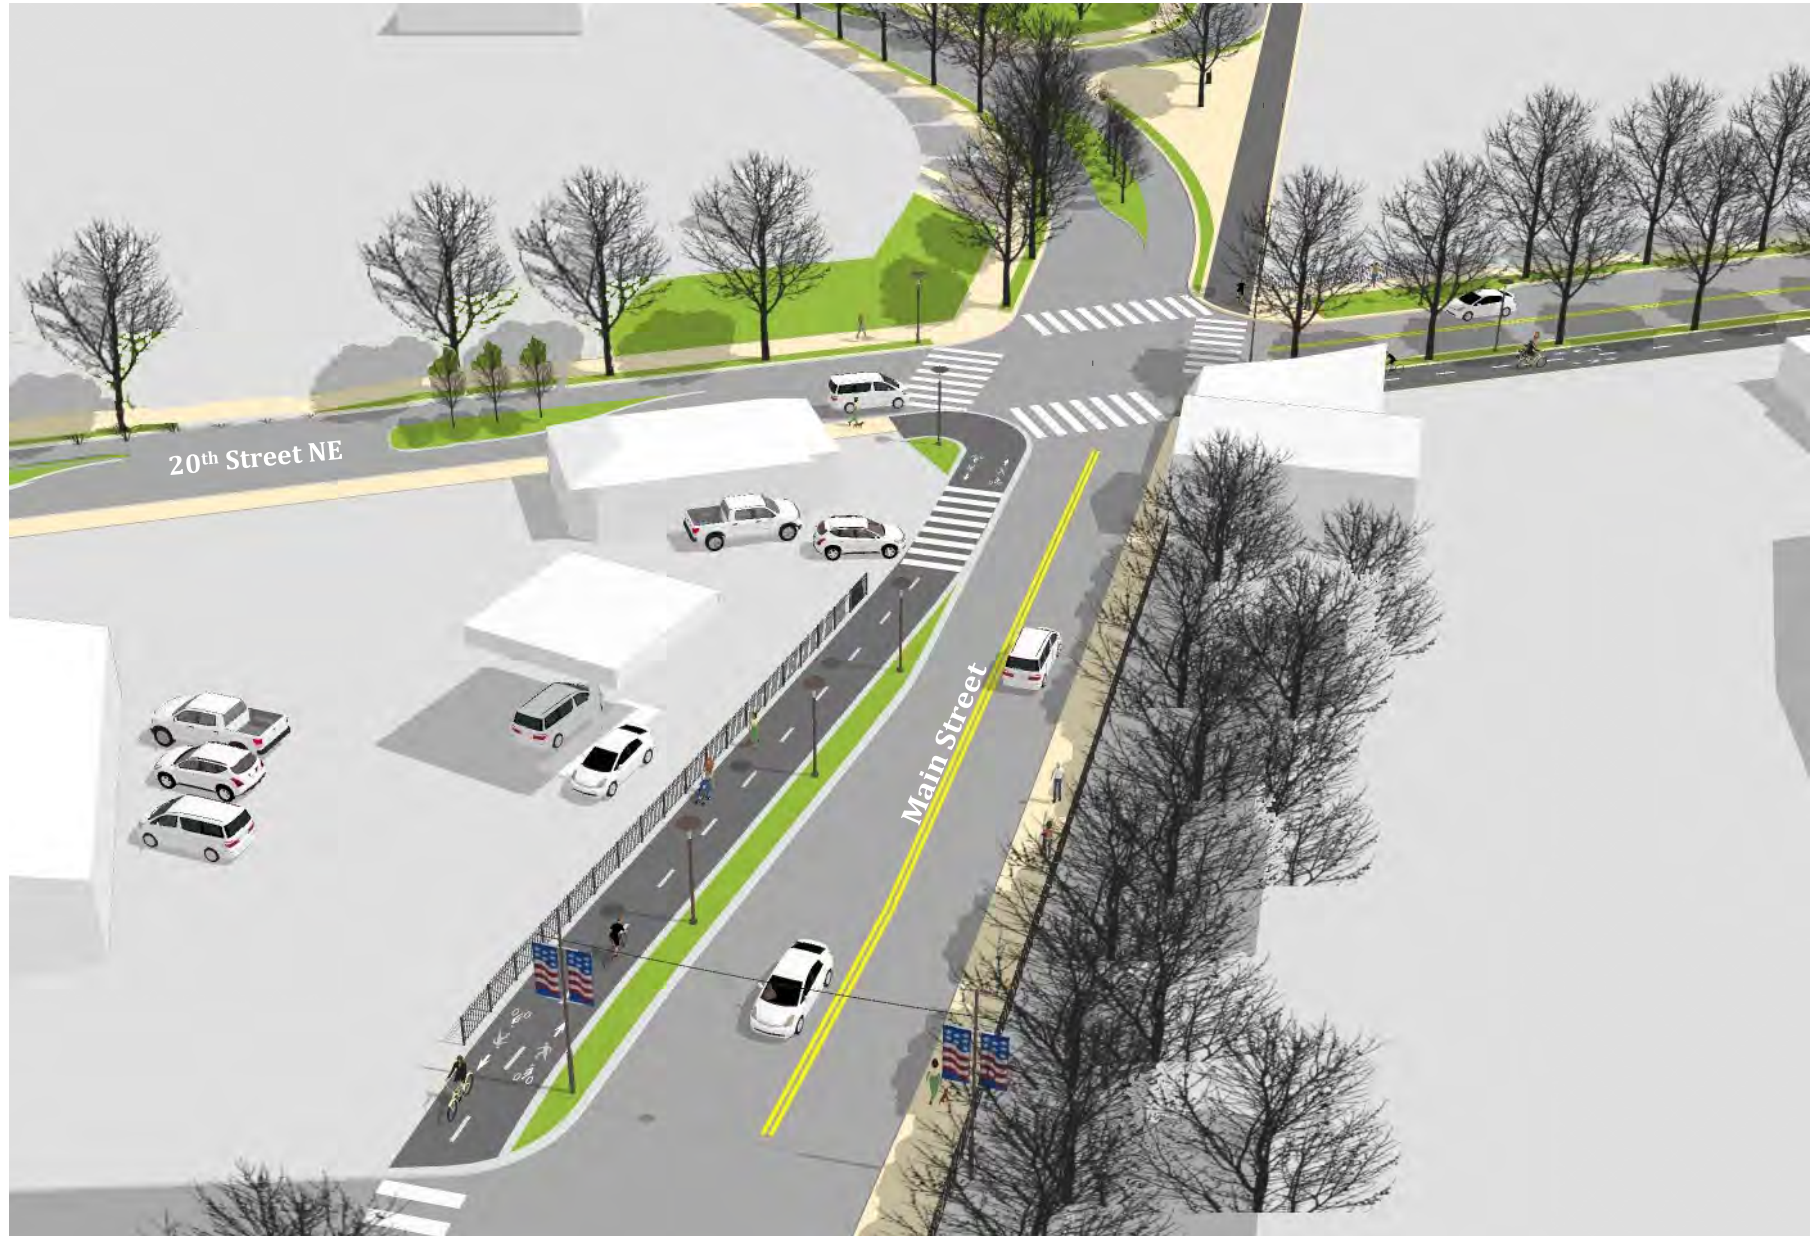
Retail Street Illustration (Main Street View Looking North Between Lakeshore Dr. NE and 20th St. NE)
